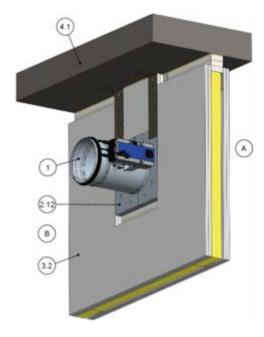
Dry mortarless installation into a lightweight partition wall, with installation kit GL2
